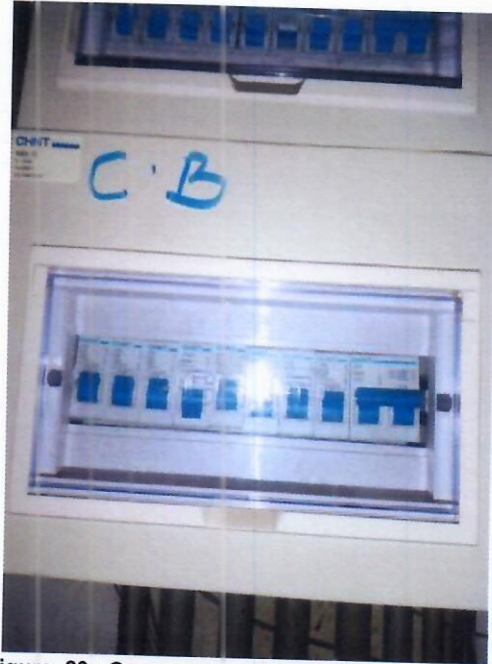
Consumer's Unit for Lights on First Floor of Main Building
